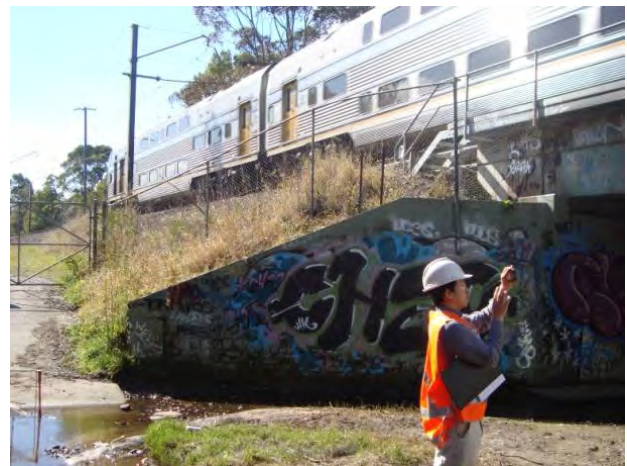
Pre-construction – Proximity of proposed embankment widening relative to existing train line.
